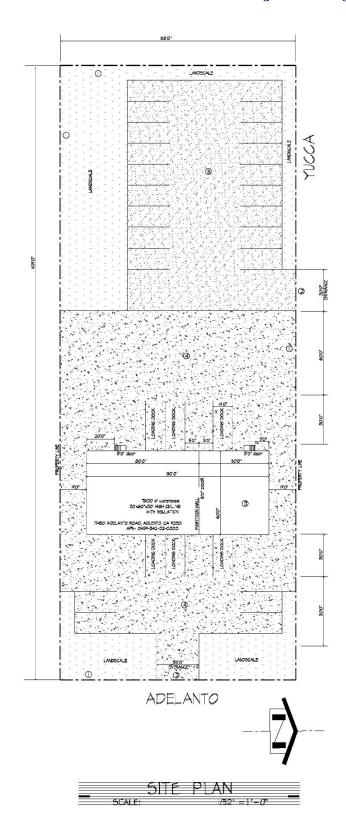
SITE PLAN OF PROJECT SITE
